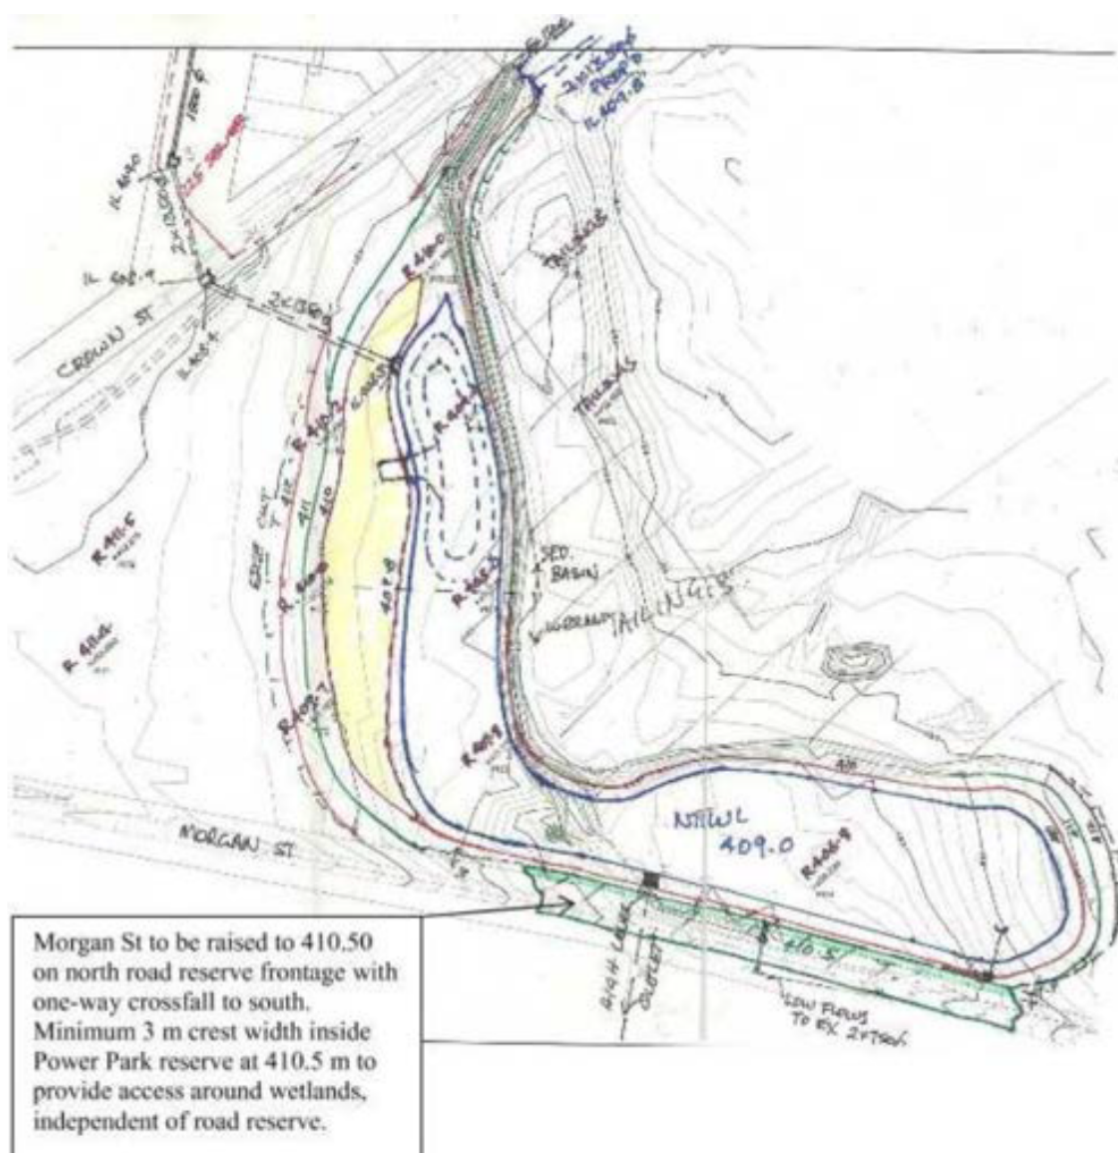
RETARDING BASIN 28 CONCEPT LAYOUT
